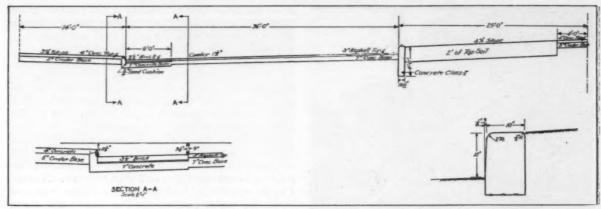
Typical Boulevard Section from Twelfth Street to Liberty Street
